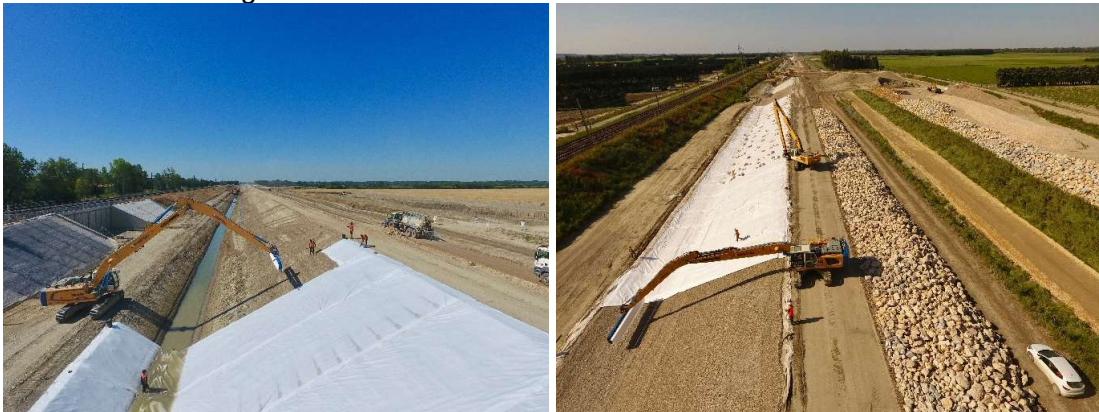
Stage 1 : Geotextile filter on embankment (left) – Stage 2 : gravel layer & second geotextile on gravel (right)
